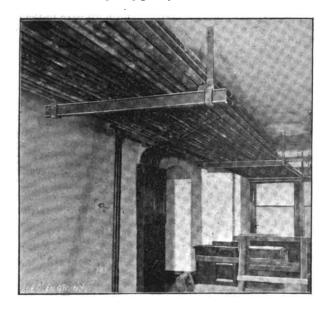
RUNWAY OF INTERIOR CONDUIT TUBING.
